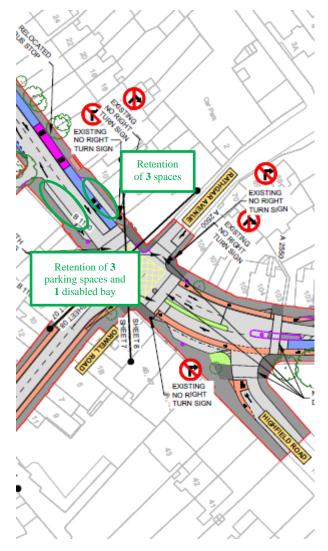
Proposed scheme design on Terenure Road East (west of Rathgar Avenue)
